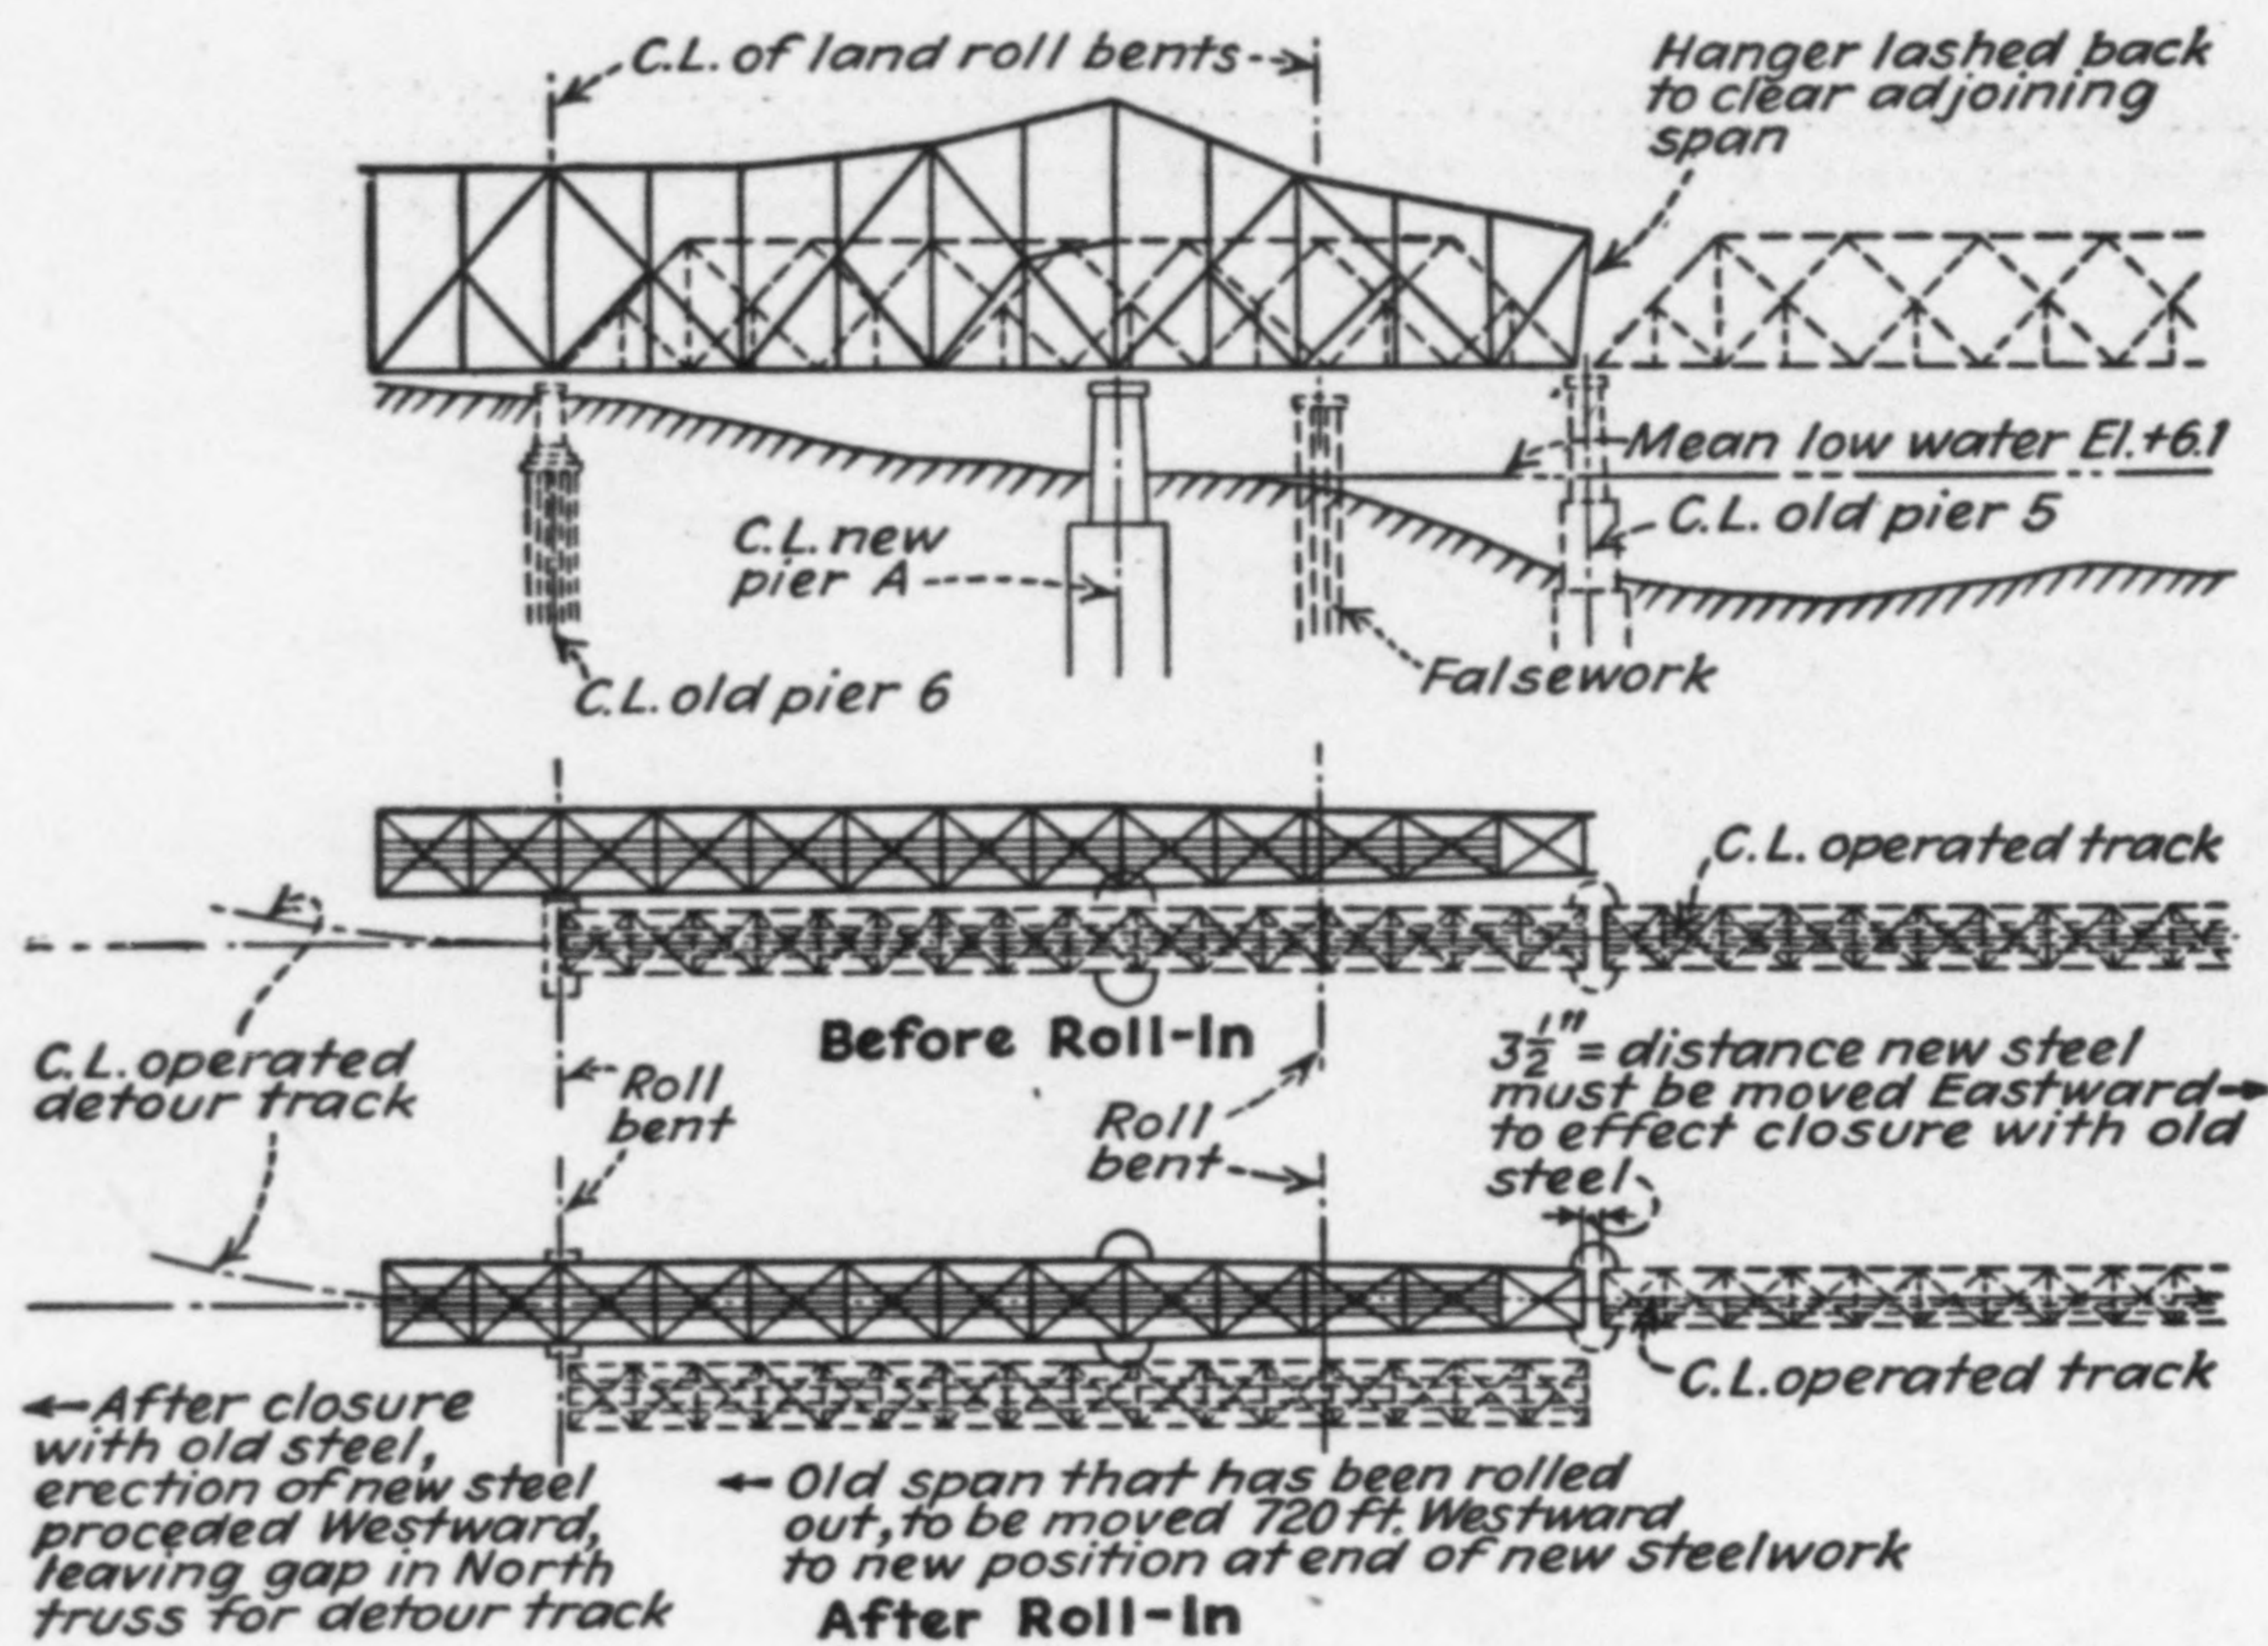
How old truss was rolled out and part of new span was rolled in.
